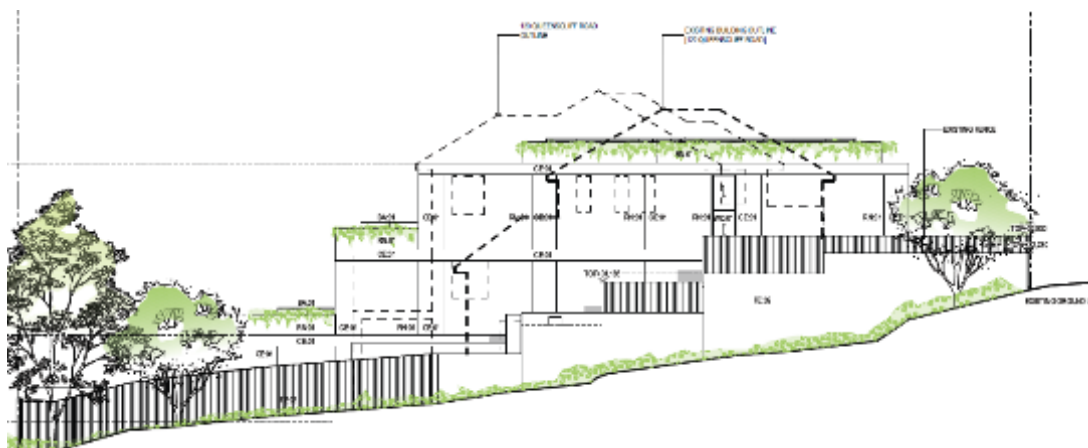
existing and proposed building outlines (eastern elevation) the proposed building is lower than the roof ridge heights of the existing building
